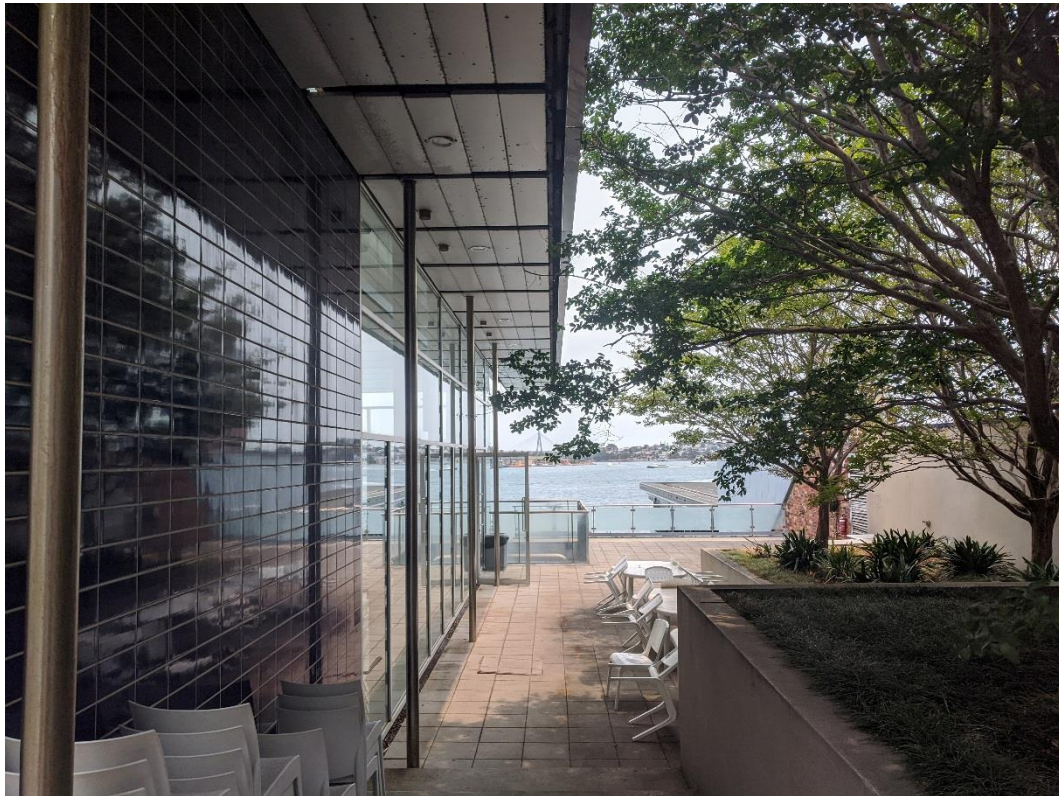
Steel Framing and Glazing of 2001 25m Pool Hall Structure
